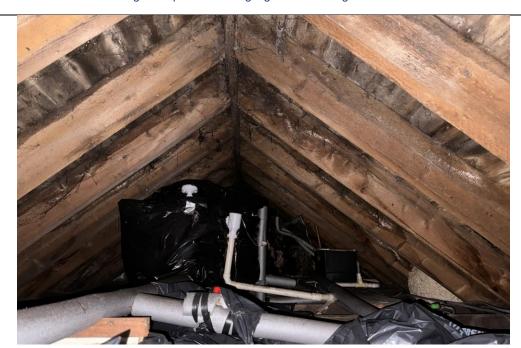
Inside main farm building roof space. Showing signs of water ingress and rot
